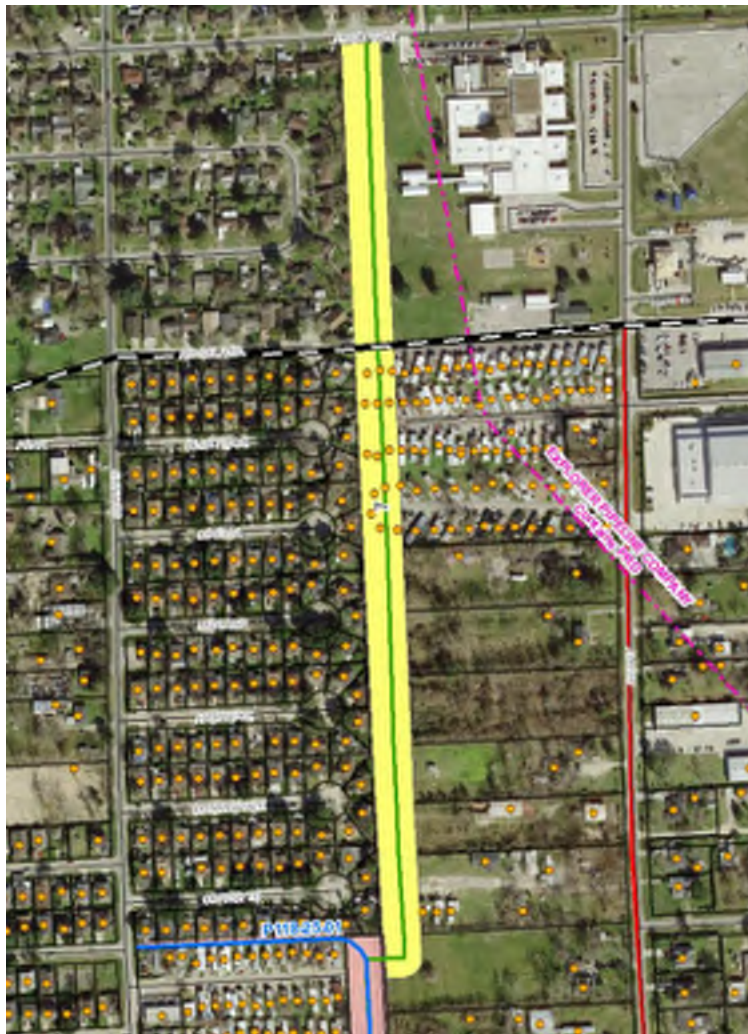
Feature 7 “Channel Extension” – Layout and Location
